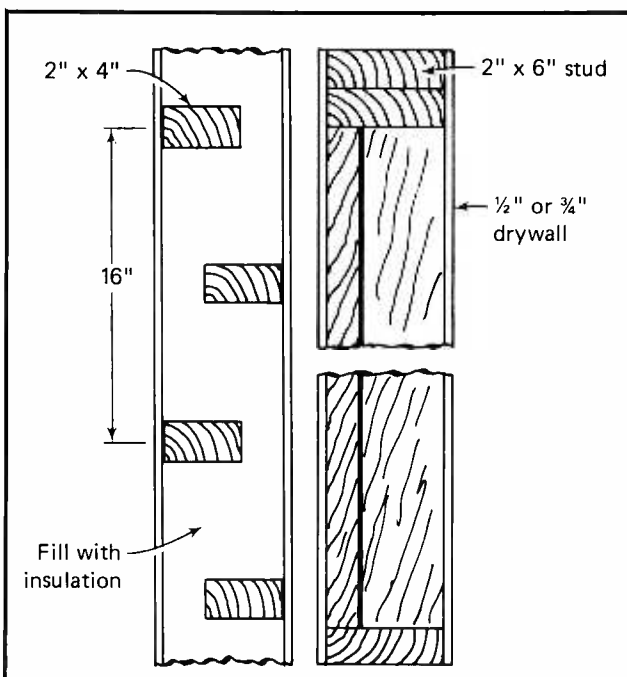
"Staggered-stud" control room wall construction (top and side view), not including materials "wafering" for sound treatment of outer wall surfaces. Submitted by Don Chiles.
